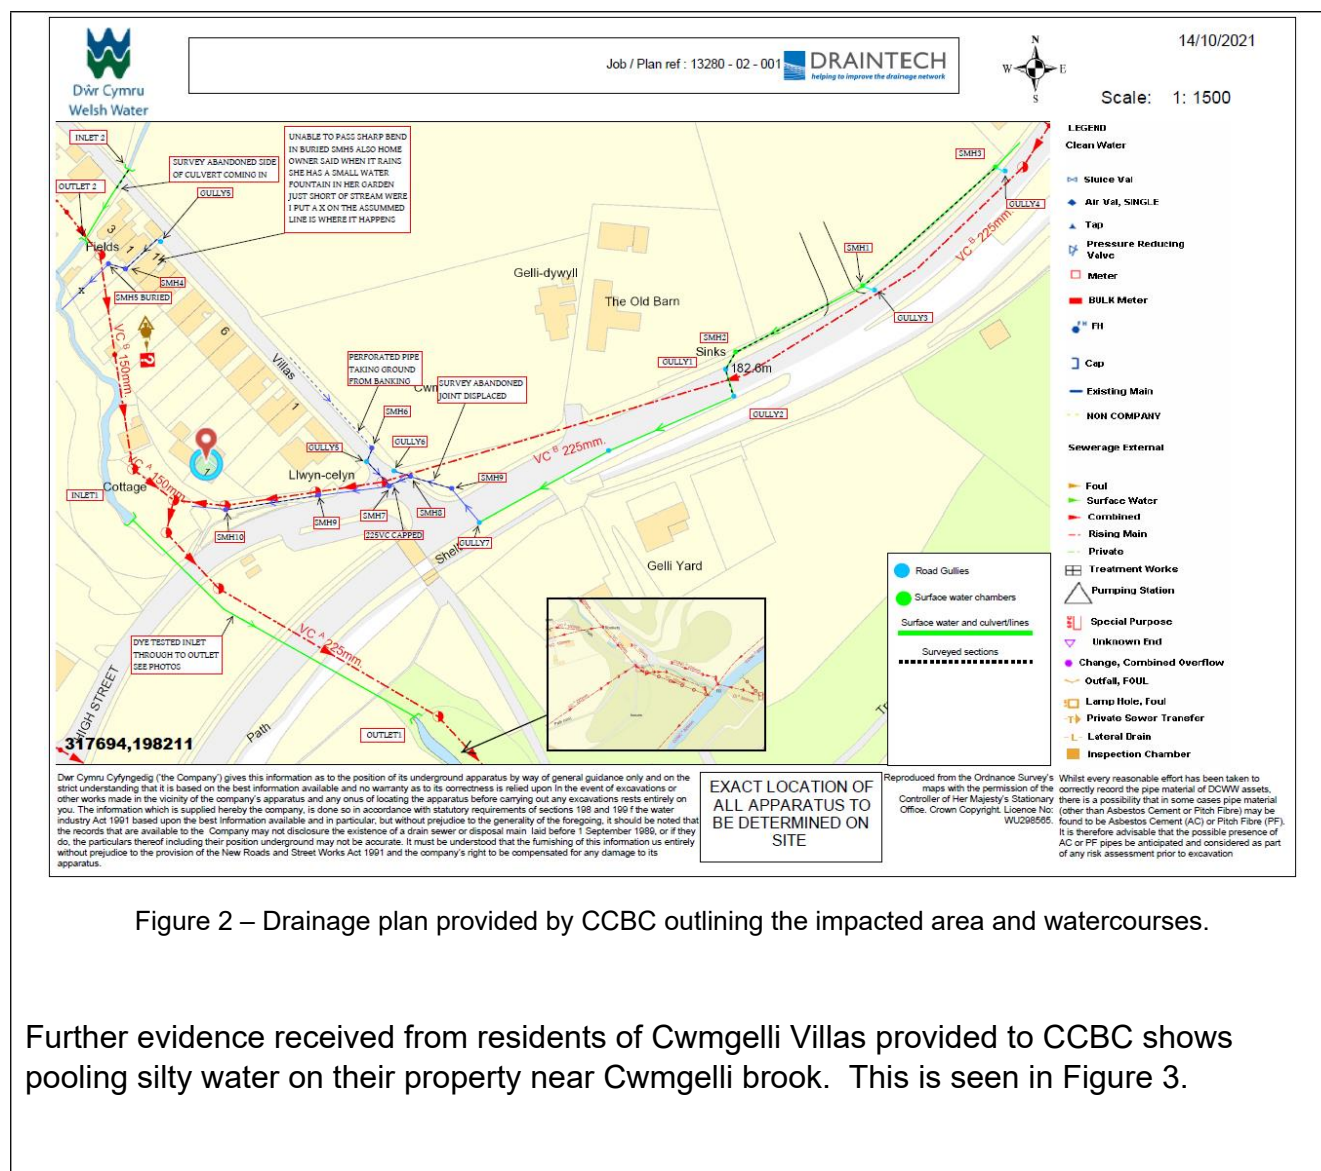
Drainage plan provided by CCBC outlining the impacted area and watercourses.
